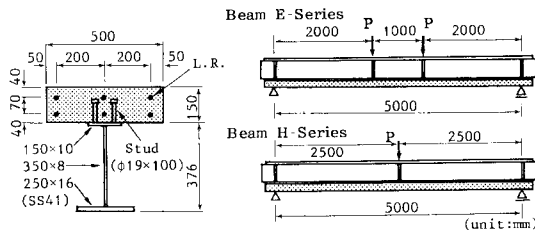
Cross-Section and Loading Points for Beam Specimens.
